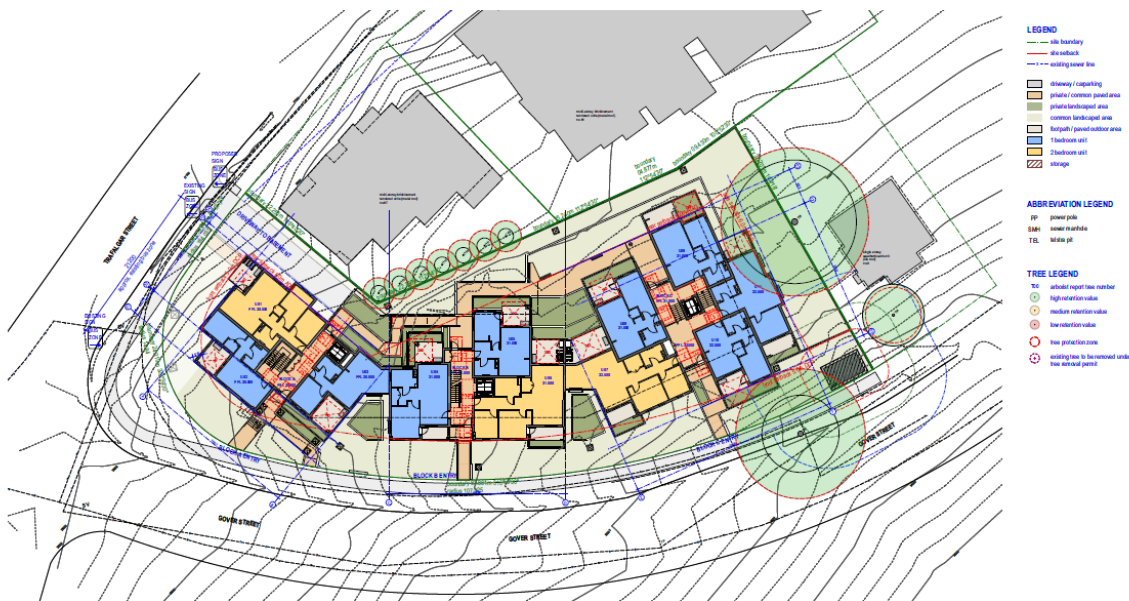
Extract from Architectural Plans – Site Plan (Source: Architectural Plans, Kennedy Associates Architects, dated 29/08/2024)
